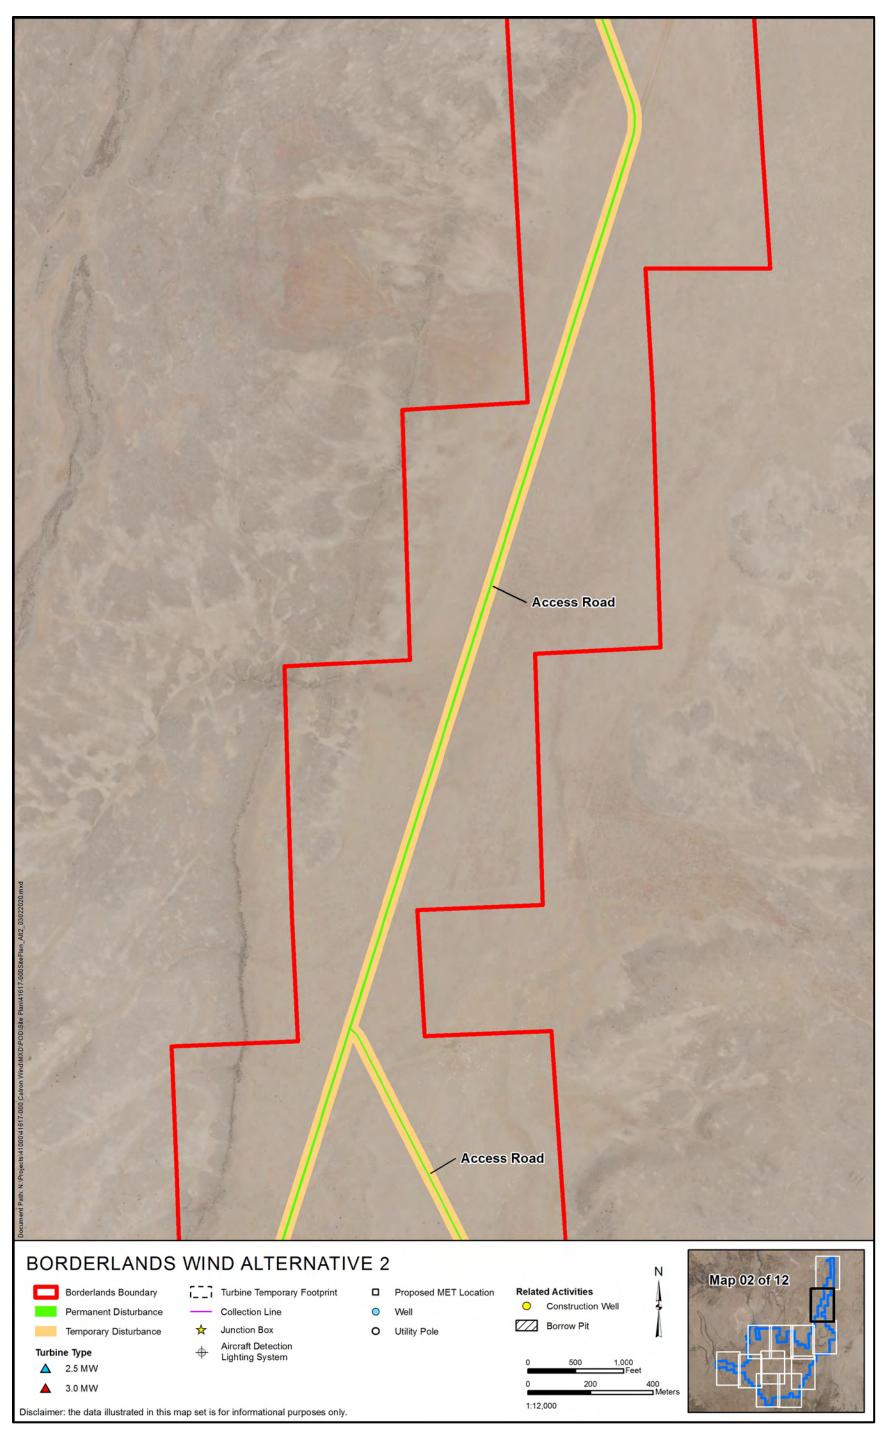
Alternative 2 Site Plan (Map 2 of 12)
